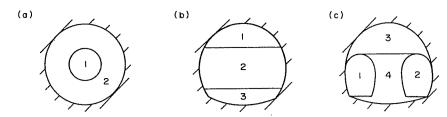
Examples of multiple stage excavation in the tunnel section: (a) pilot tunnel with boring machine, (b) head and bench, and (c) side drift tunneling method
